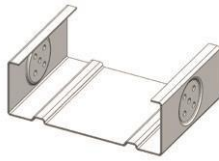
DETAILS OF LOAD-BEARING STEEL CONSTRUCTION ELEMENTS
